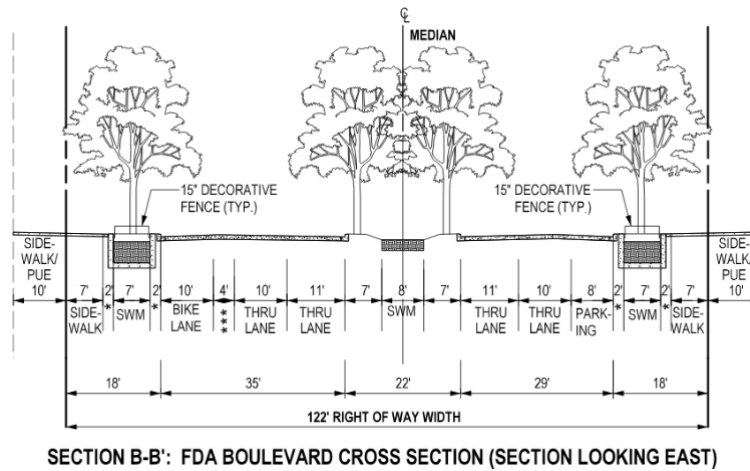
Approved FDA Boulevard Cross Section, Preliminary Plan No. 120180240
